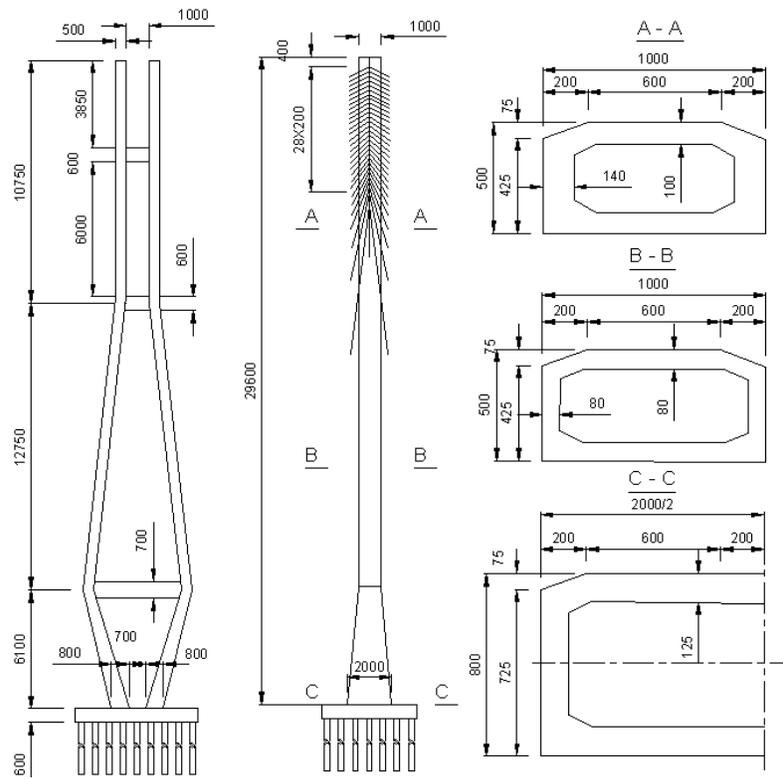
Transverse and Longitudinal View of the Pylon with Its Cross Sections of the Example Steel Cable-Stayed Bridge (Unit:cm)
